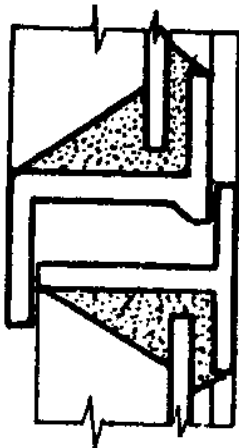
Detail Through Bottom of Top-Hung Ventilator
